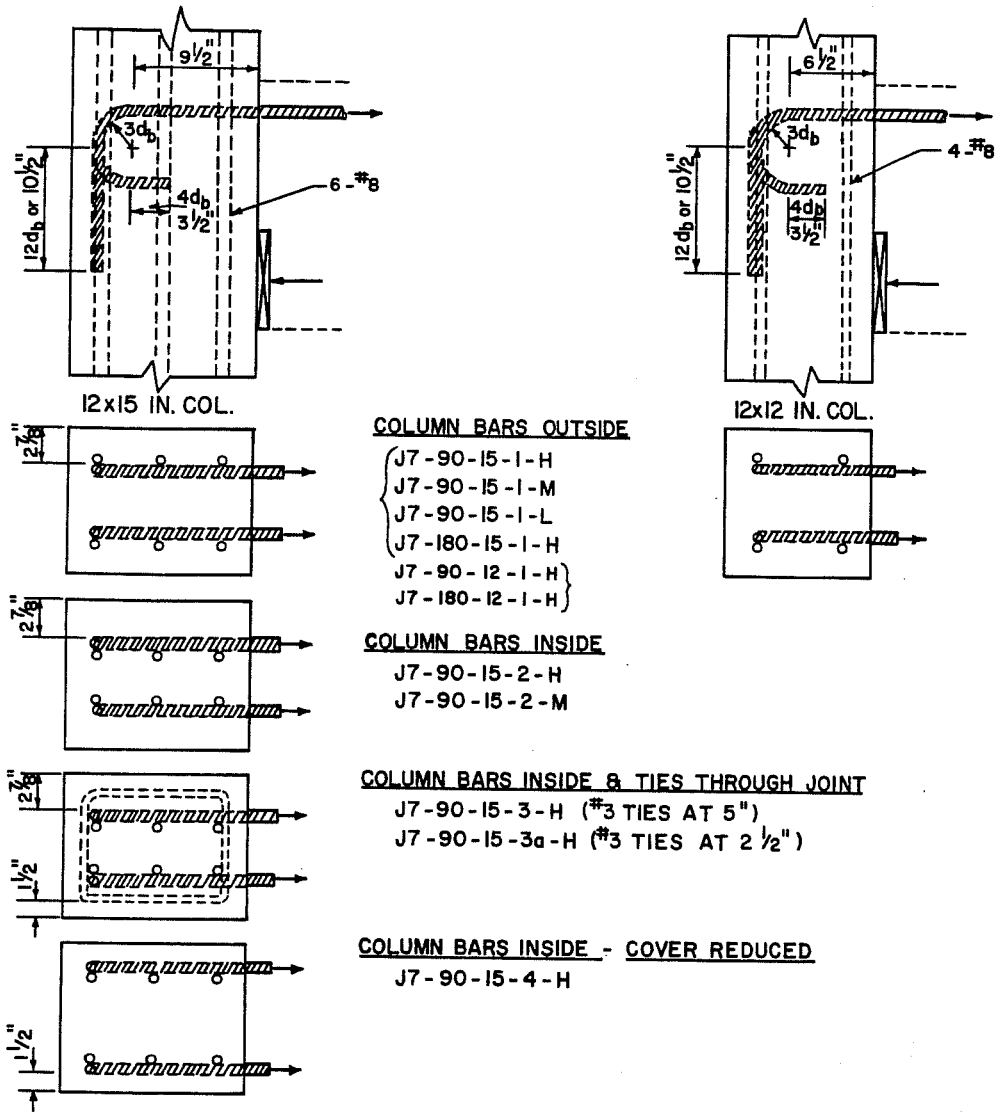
Joint details of the J7 series of #7 hooked bar specimens, Marques and Jirsa^[35].
